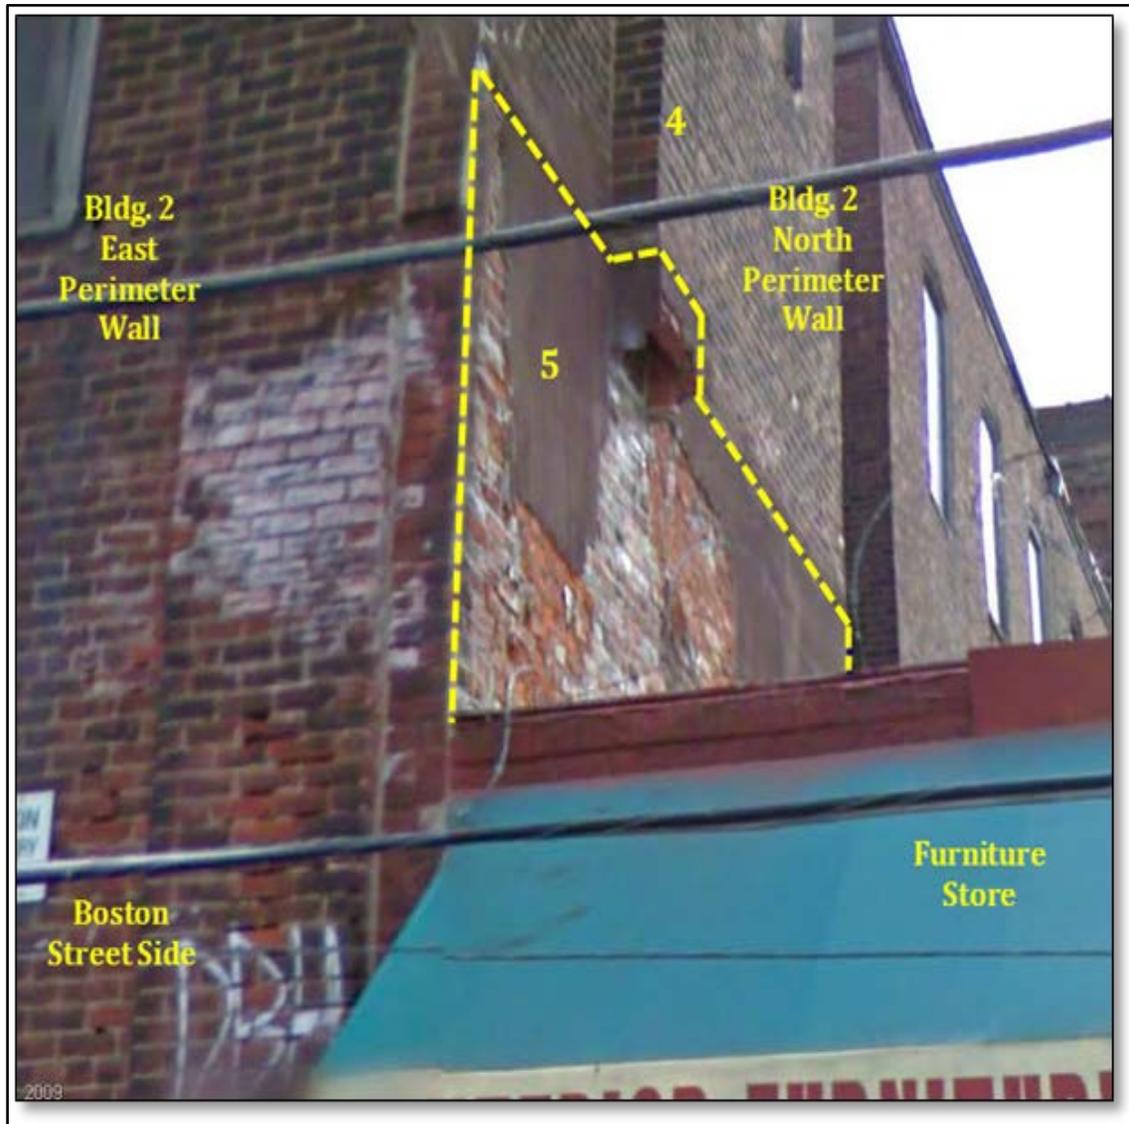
Collapse indicators detail of north perimeter of Building #2, Side A exposure.
